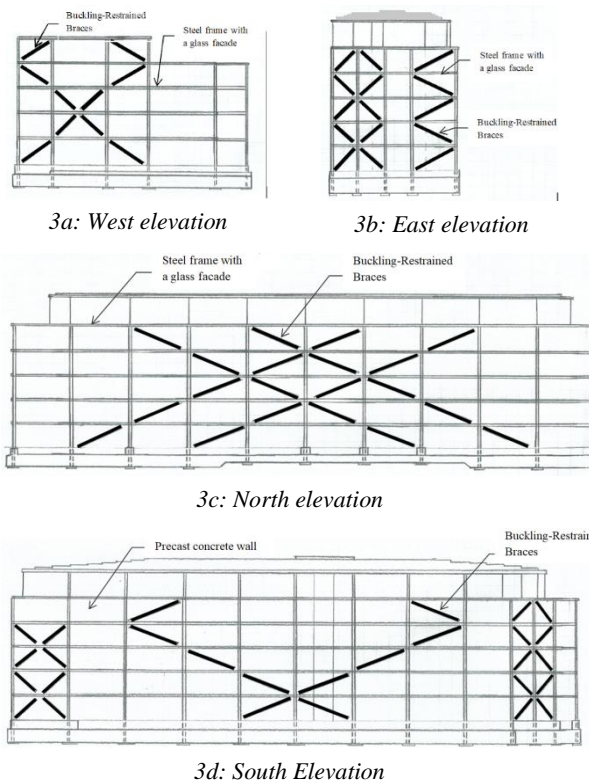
Elevation of PwC Centre (adapted from engineer’s drawings).
